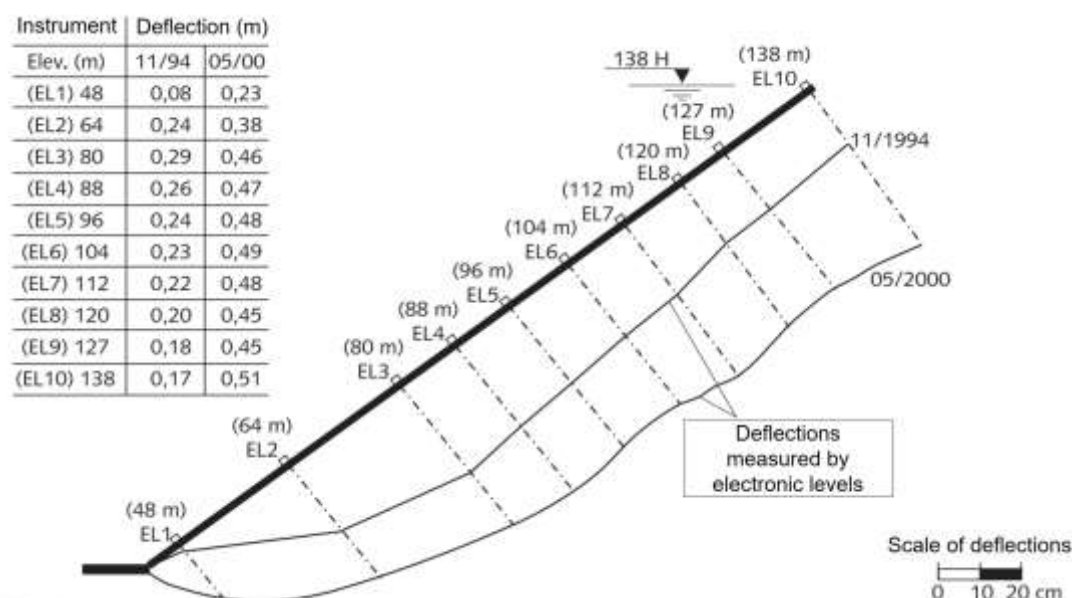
Deformations on The Concrete Face of Xingó Dam
